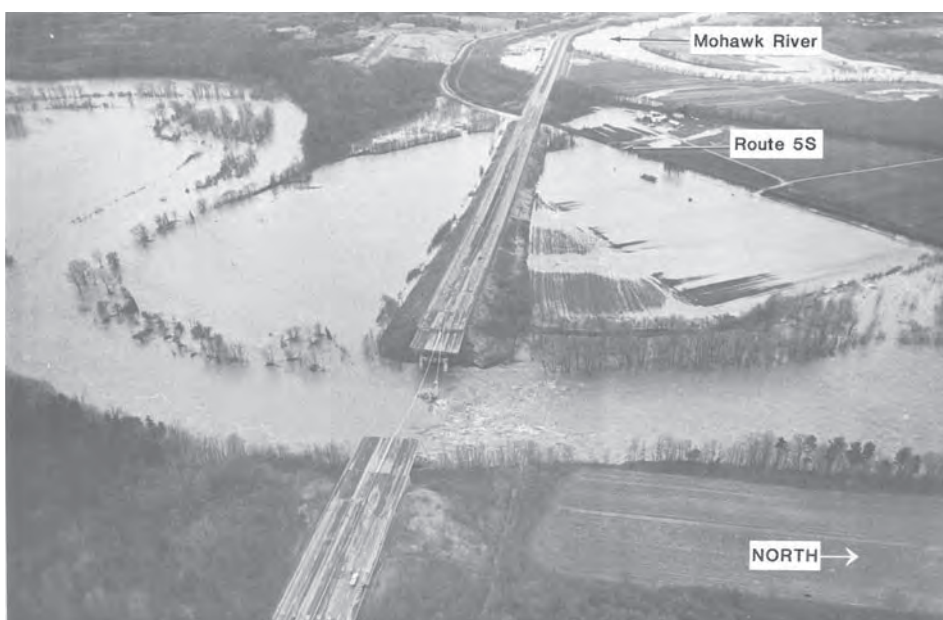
The Schoharie Creek Bridge collapsed on April 5, 1987 due to severe foundation scour after a record rainfall. (NYSTA, 1987)
